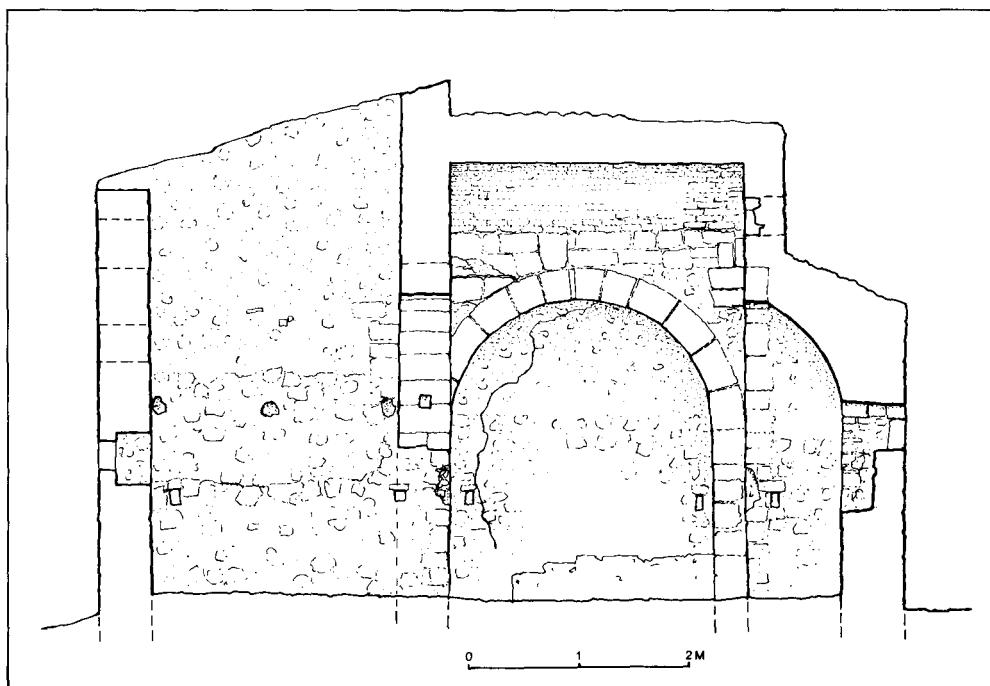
An east-west section through the chapel looking north. (Drawn by Sheila Gibson)
